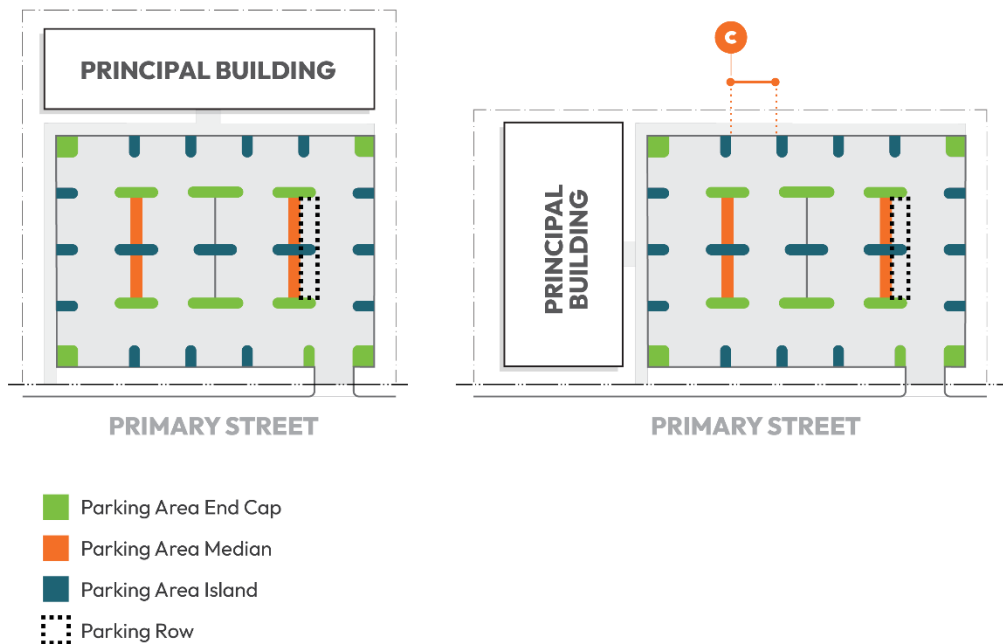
Off-Street Parking Areas in Front or to Side of Principal Buildings
